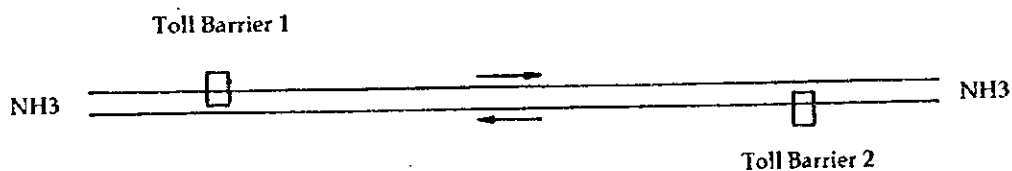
Toll Collection System proposed for Gwalior Bypass
